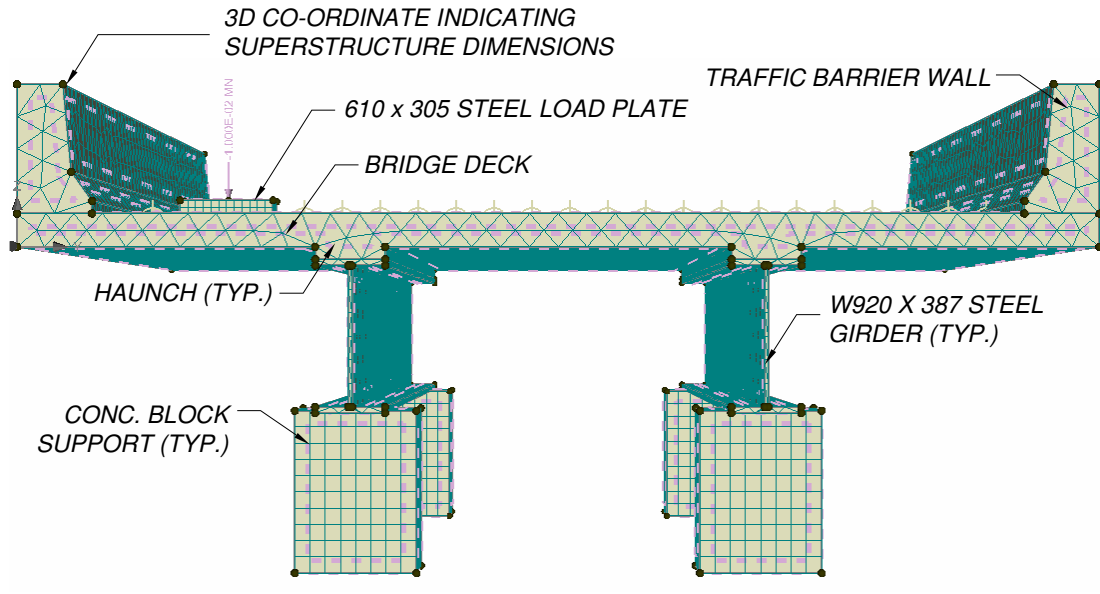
(c): Perspective view of finite element discretization for the cantilever sections
